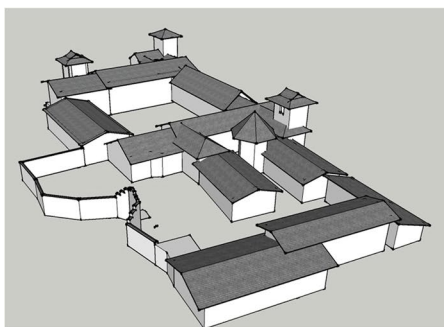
Chongqing rammed earth manor watchtower with a flexible layout in Bishan and Jiangjing (Source: the author)
